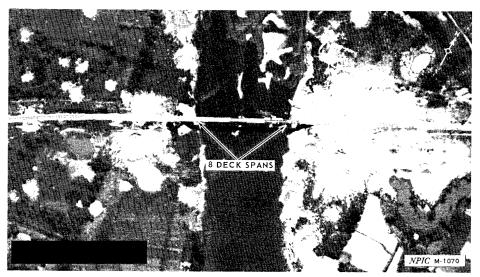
LANG LAU RR BRIDGE OVER SONG CAU, KEP/THAI NGUYEN RAIL LINE, NORTH VIETNAM
